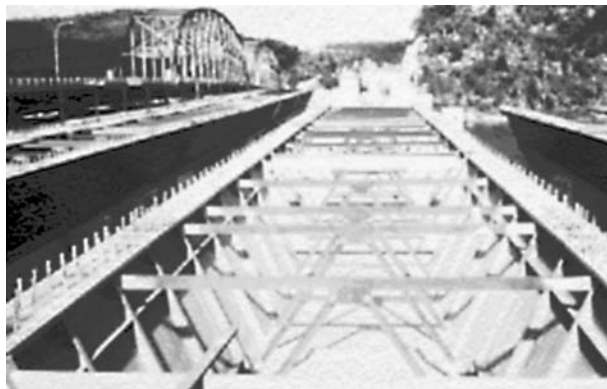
Composite box girders, Hawkesbury River Bridge, Australia.
